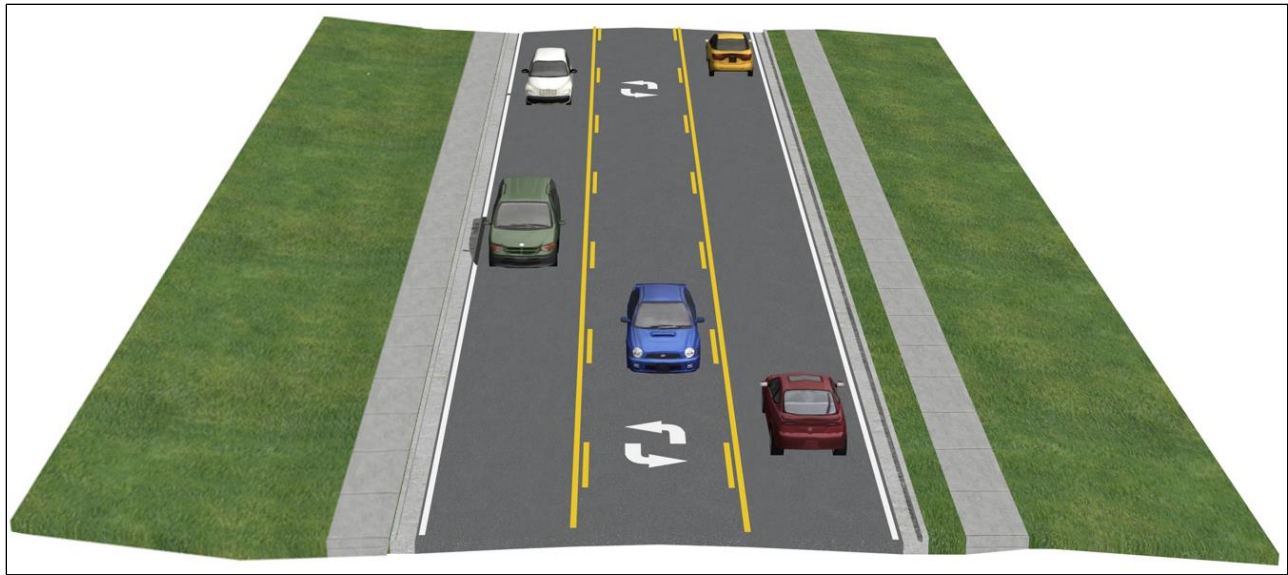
3-Lane Widening with Curb & Gutter and Sidewalks
